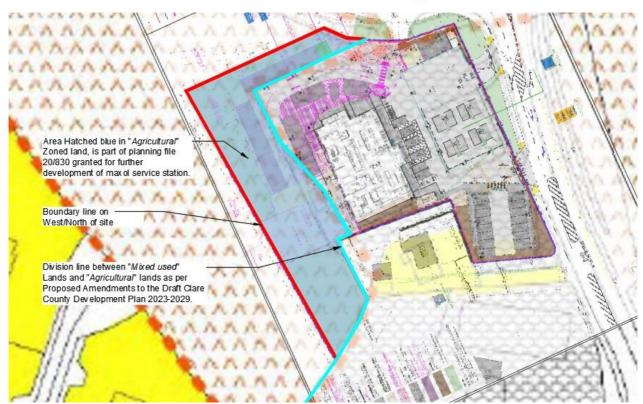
Site Layout approved under Planning Permission Ref: P20/830 (with southern boundary slightly adjusted to reflect boundary submitted under Planning Application Ref: P21/1045) overlaid onto proposed zoning Map as per Proposed Amendments to Draft Clare County Development Plan 2023-2029.
